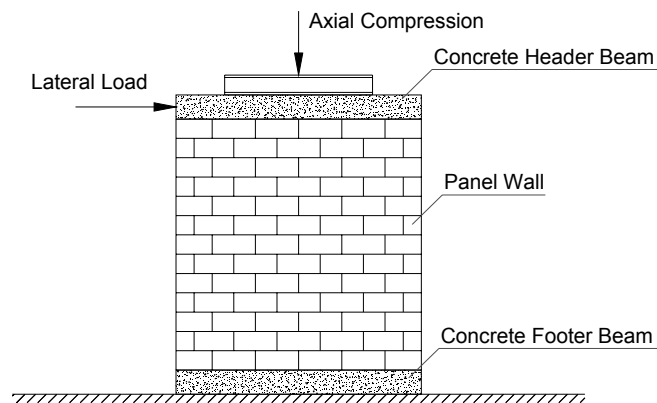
Typical test configuration of shear walls under static monotonic/cyclic lateral loading.
